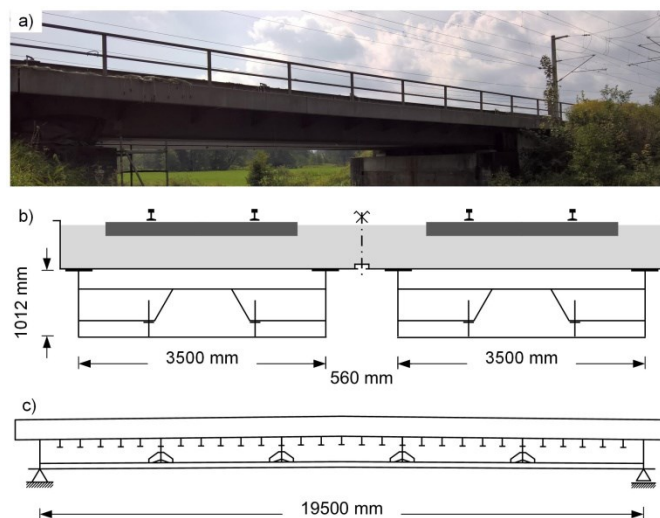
Investigated steel bridge [10]: a) photo caption; b) cross-section at mid-span; c) longitudinal section
